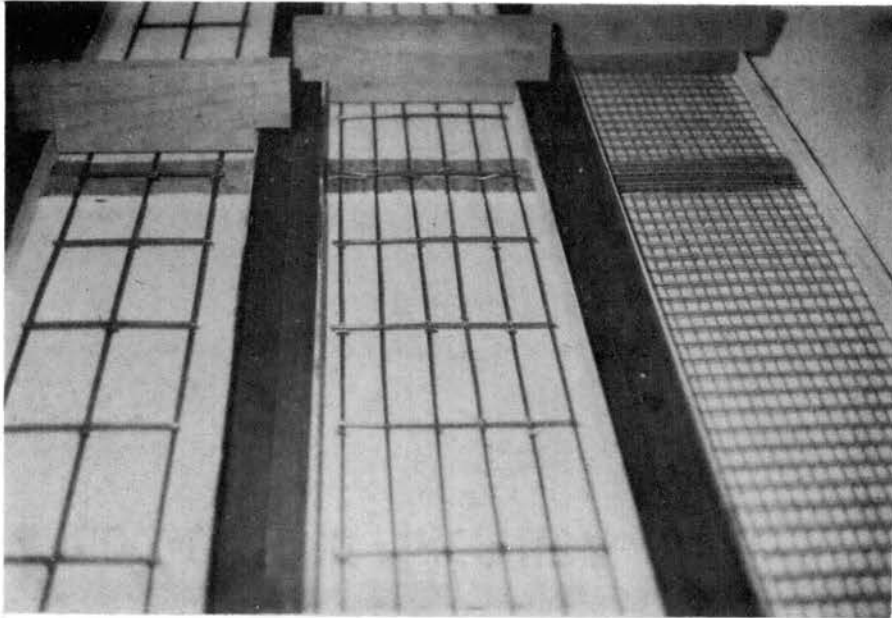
Casting Bed and Reinforcement Used for Validation Tests, Strike Boards in Background. Wire sizes, left to right, No. 6, No. 10 and No. 14.
